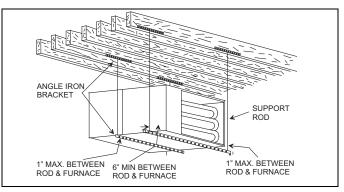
Typical Suspended Furnace / Crawl Space Installation
